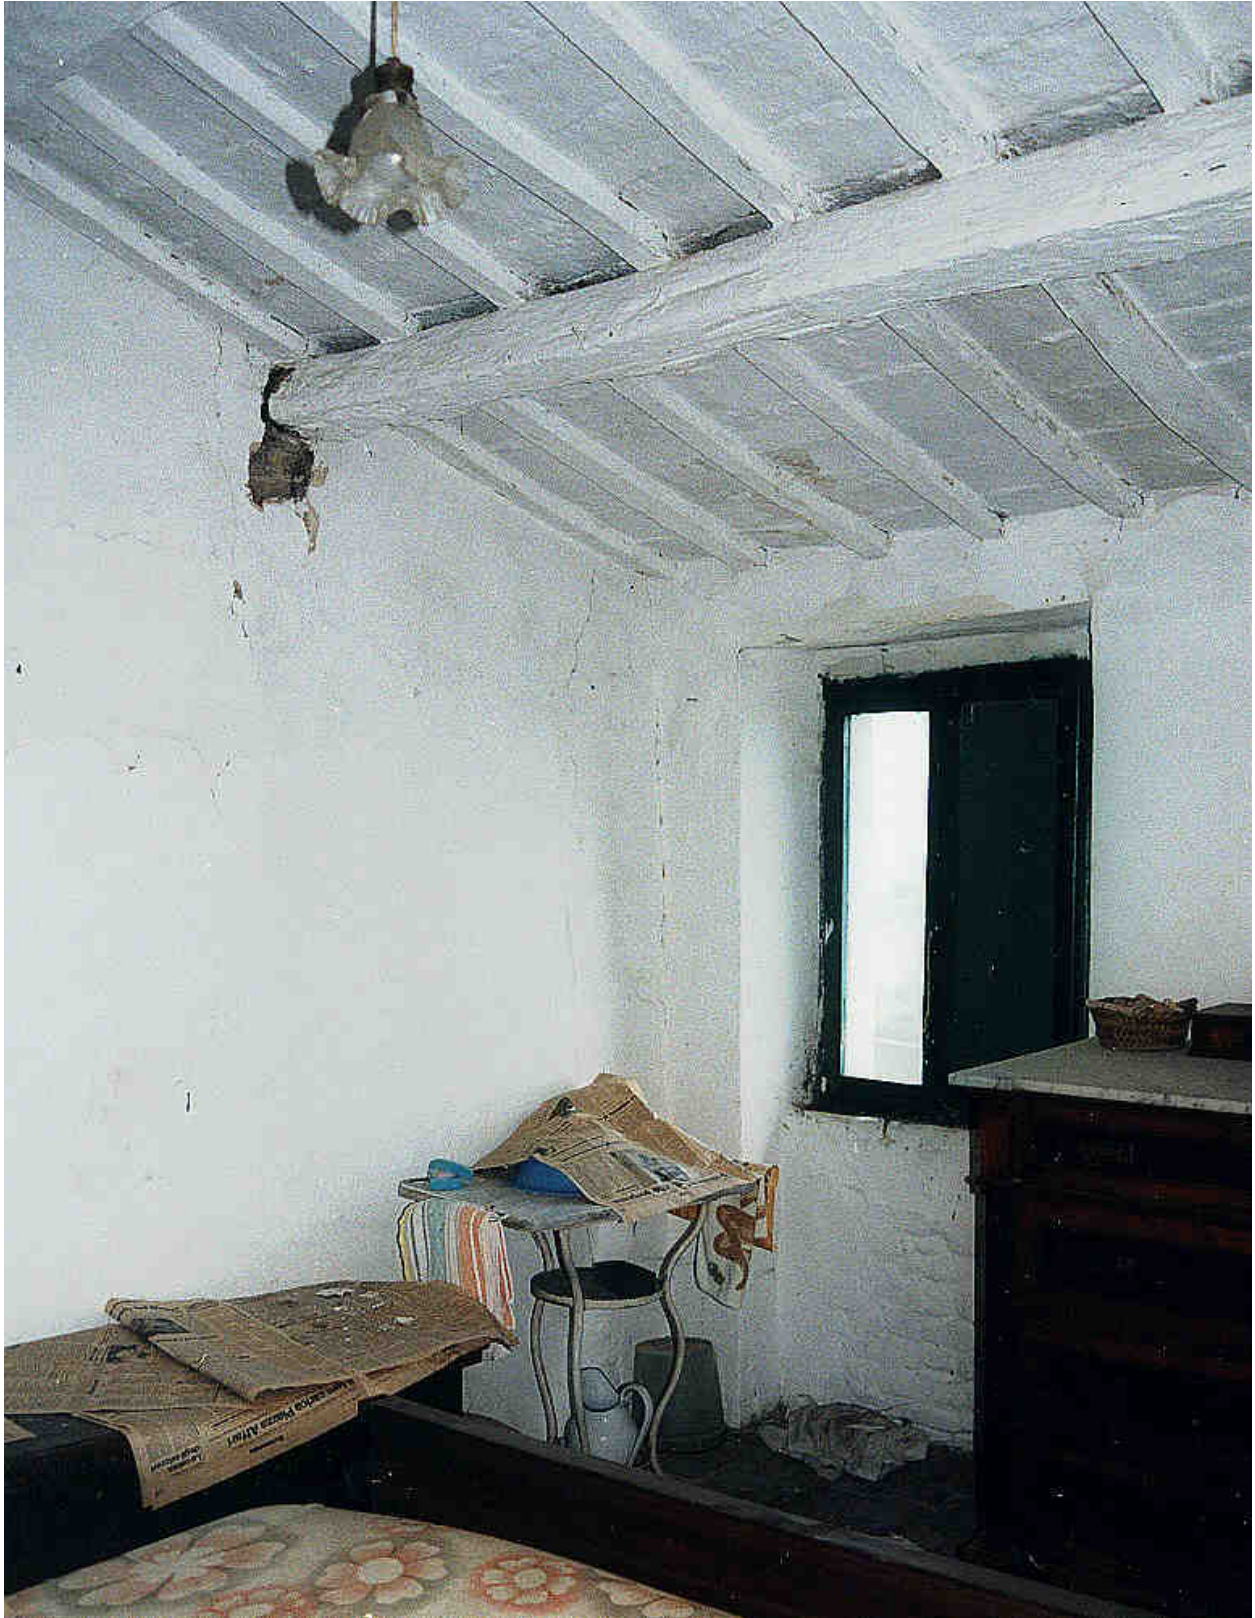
A: Critical Structural Details - Brick Walls and Sloping Timber Roof
